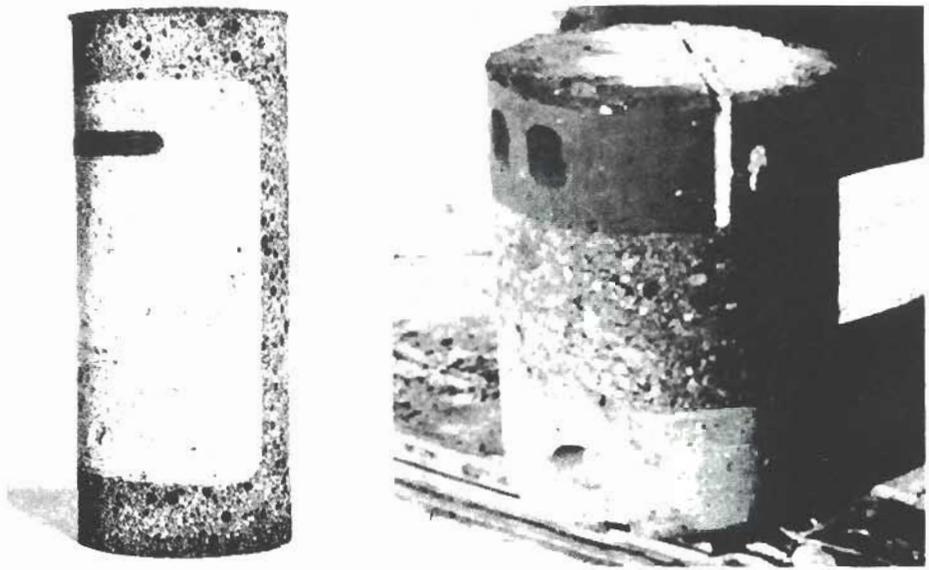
Cores from Brick and Block Walls Showing Monolithic Construction of the Various Constituents.
